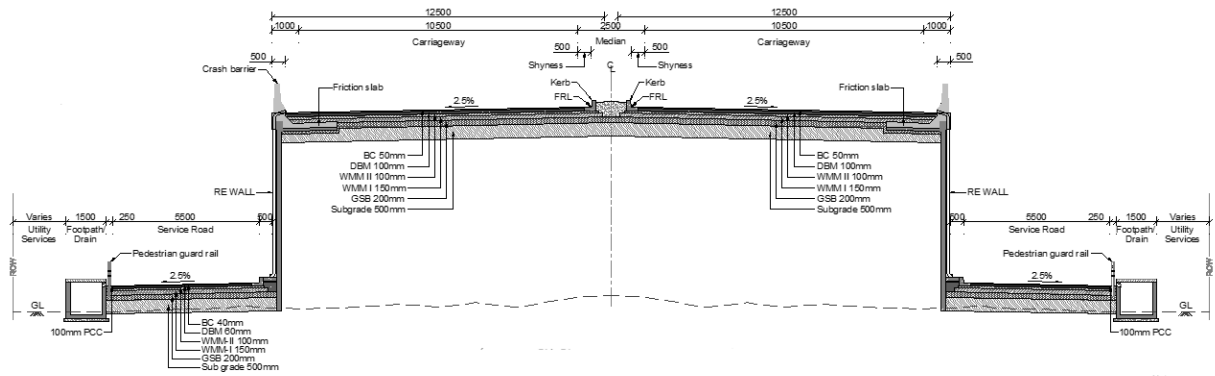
TCS 10.3- Approach Of Elevated Structures
